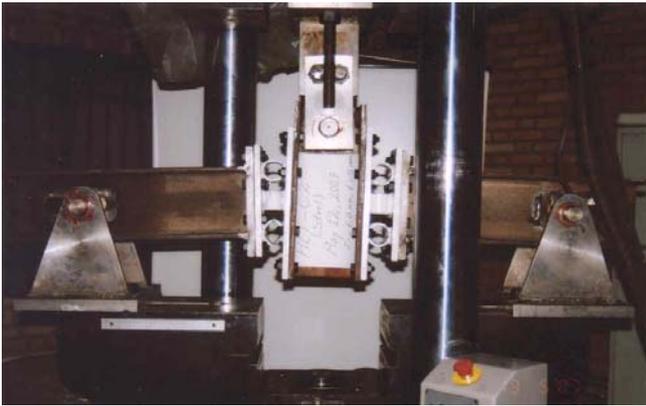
Second test assembly, with HLT-C2 specimens, at its utmost upper position, before failure.
